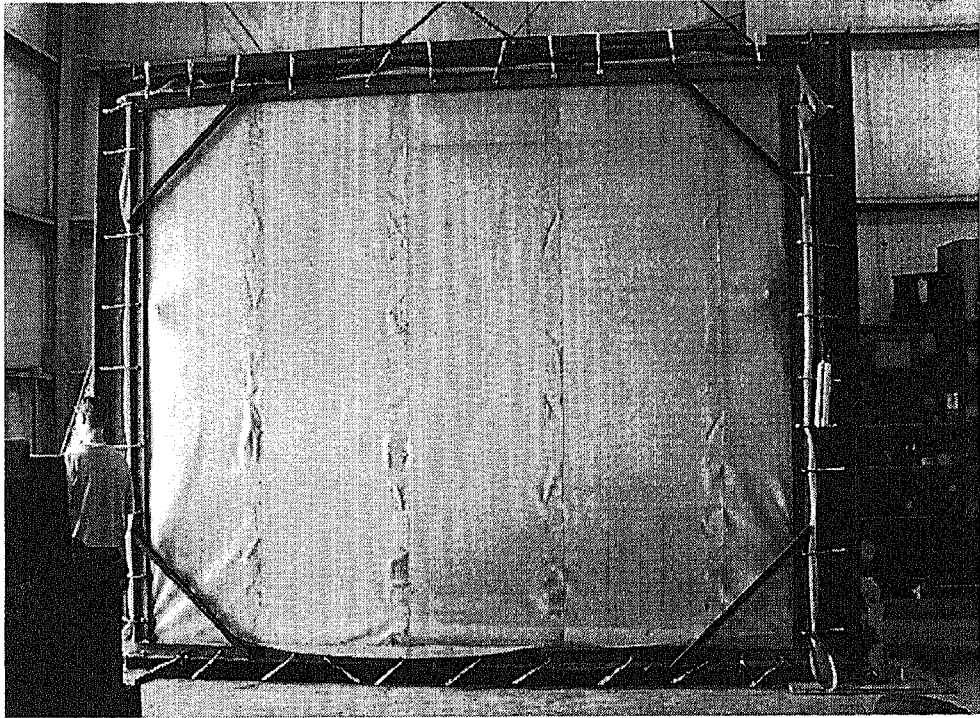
Typical Steel Stud Wall Test with Latex Membrane in Place
